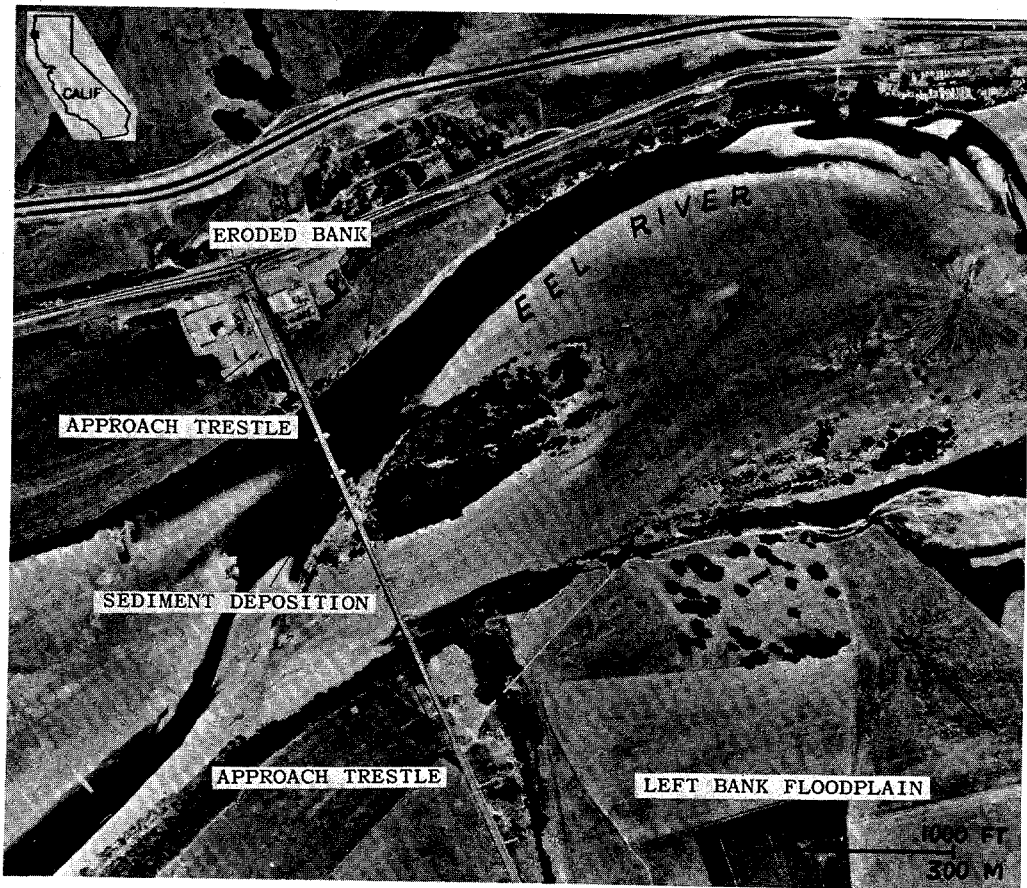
Aerial view in 1959 of site showing deposition of sediment downstream from piers 6 and 7, Eel River at SR-1. (From Calif. Dept. of Transportation.)
